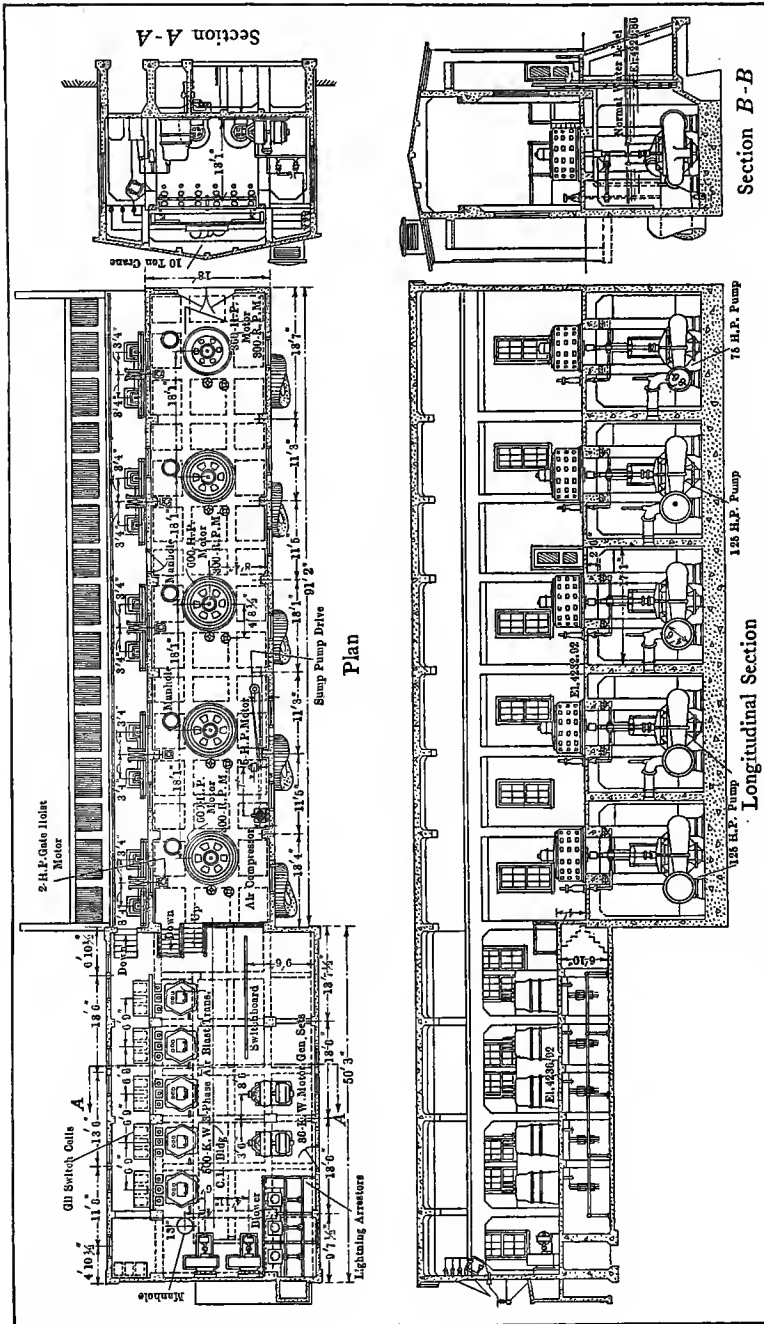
General plan and sections of pumping station, Minidoka Project, Idaho.
